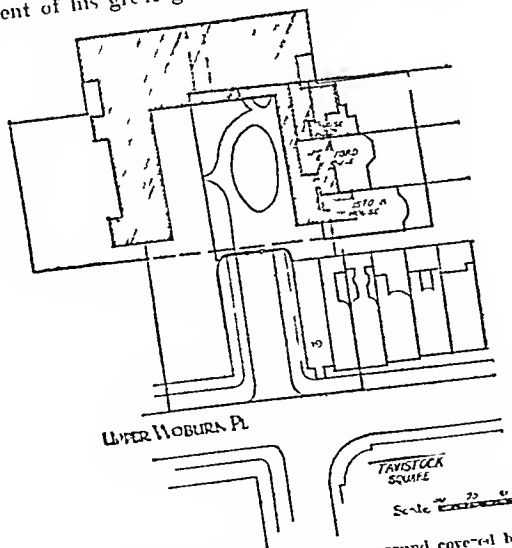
The hatched area shows the ground covered by the new building superimposed on the plan (in outline) of the old Bedford and Tavistock Houses.
